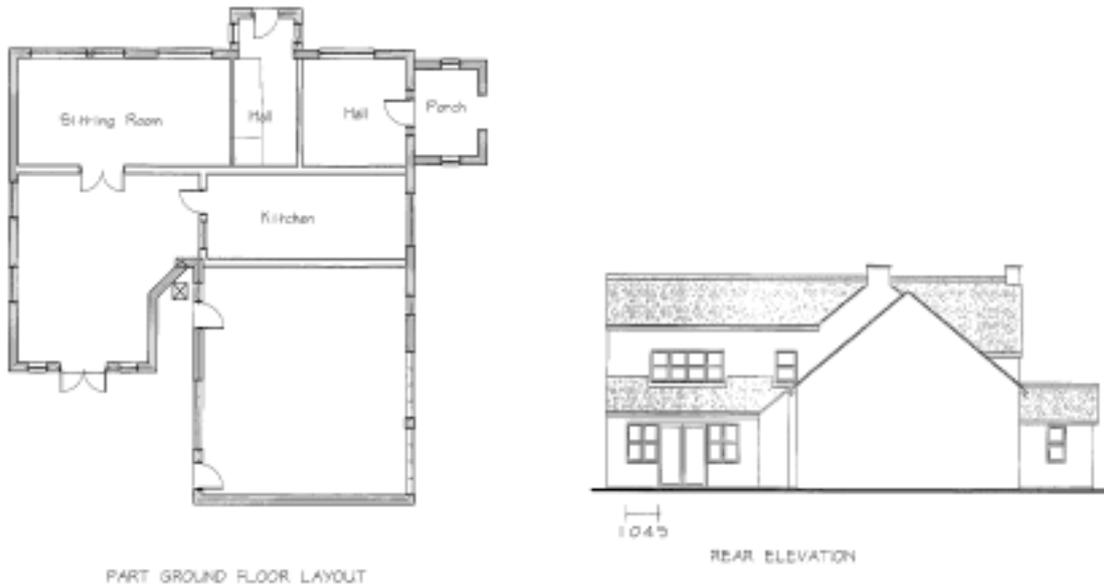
Ground Floor plan and Rear Elevation of Glebe Farm Cottage
